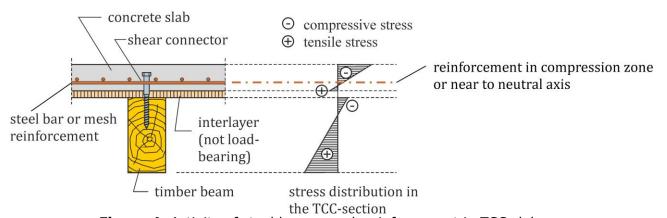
Activity of steel bar or mesh reinforcement in TCC slabs The verification of the concrete slab as a plain concrete member seems to be the most promising way. Indeed, the stresses in the concrete slab can be easily transferred into inner forces, namely the axial force N_c and the bending moment M_c , see Figure 5. According to Eurocode 2, Chapter 12, the axial force N_c must be limited to [4]
